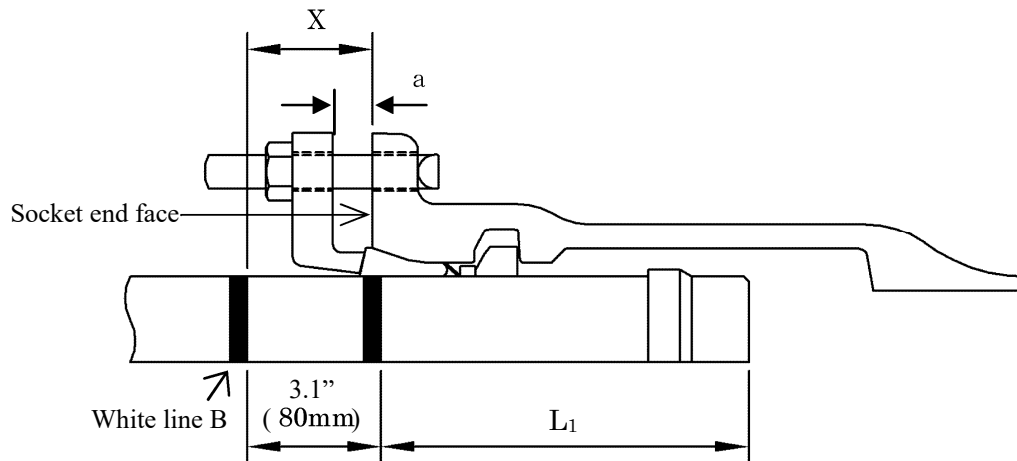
Measurement of clearance between socket end face and gland, and clearance between socket end face and white line
